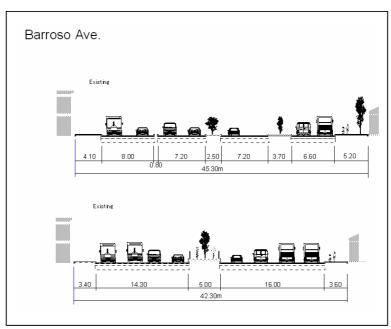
Typical Cross Sections of Almirante Barroso
